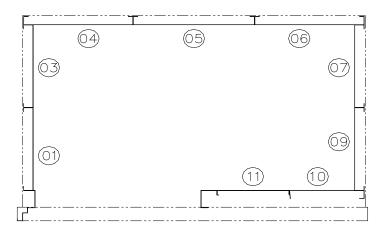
B. CAR PANEL AND ENTRANCE COLUMN ASSEMBLY
